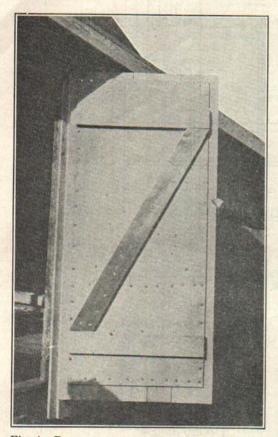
Doors are a part of the wall and therefore should be insulated.
